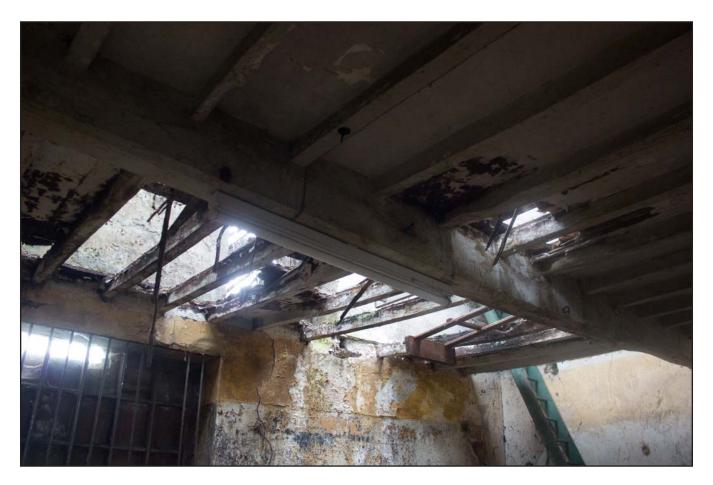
Internal shot of stables ceiling, Estate Offices & Stables, Trevor Road, Chirk - from the southwest - 2.00m scale
